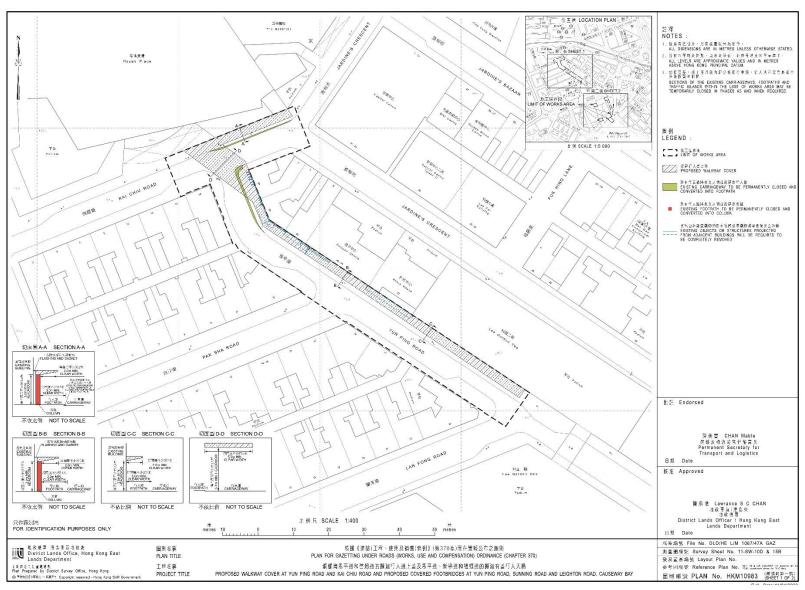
Plan showing the location of the covered walkway at Yun Ping Road and Kai Chiu Road, Causeway Bay
